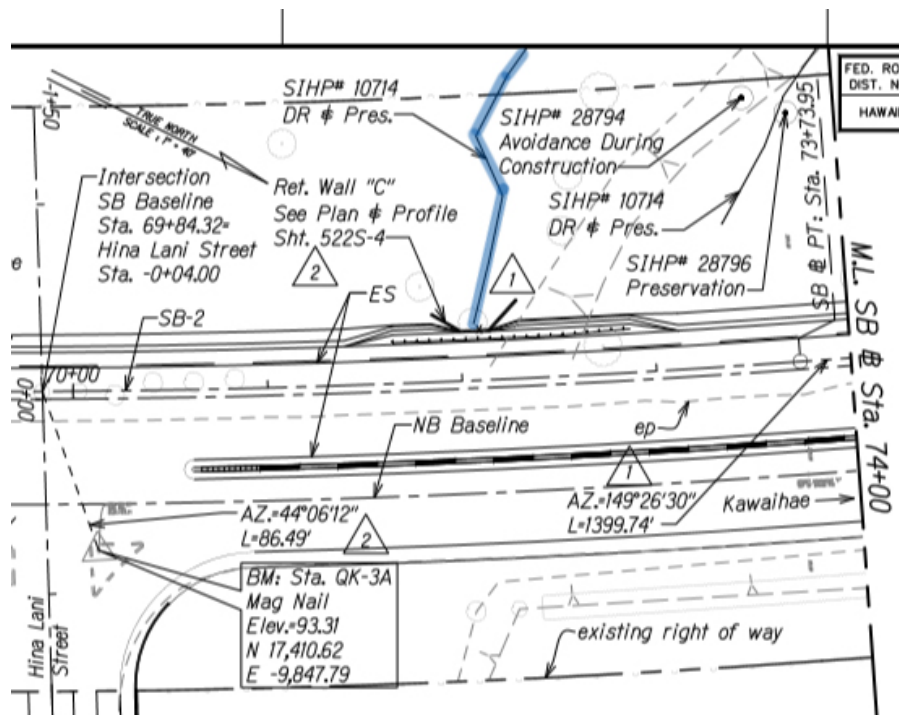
Road to Sea Trail (SIHP #10714, highlighted in blue) in Redesign Resubmittal Plans
